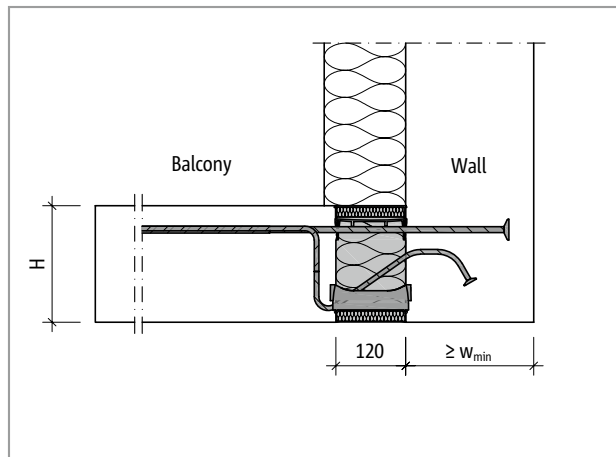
Schöck Isokorb® XT type K-U: Wall connection upwards with external insulation
